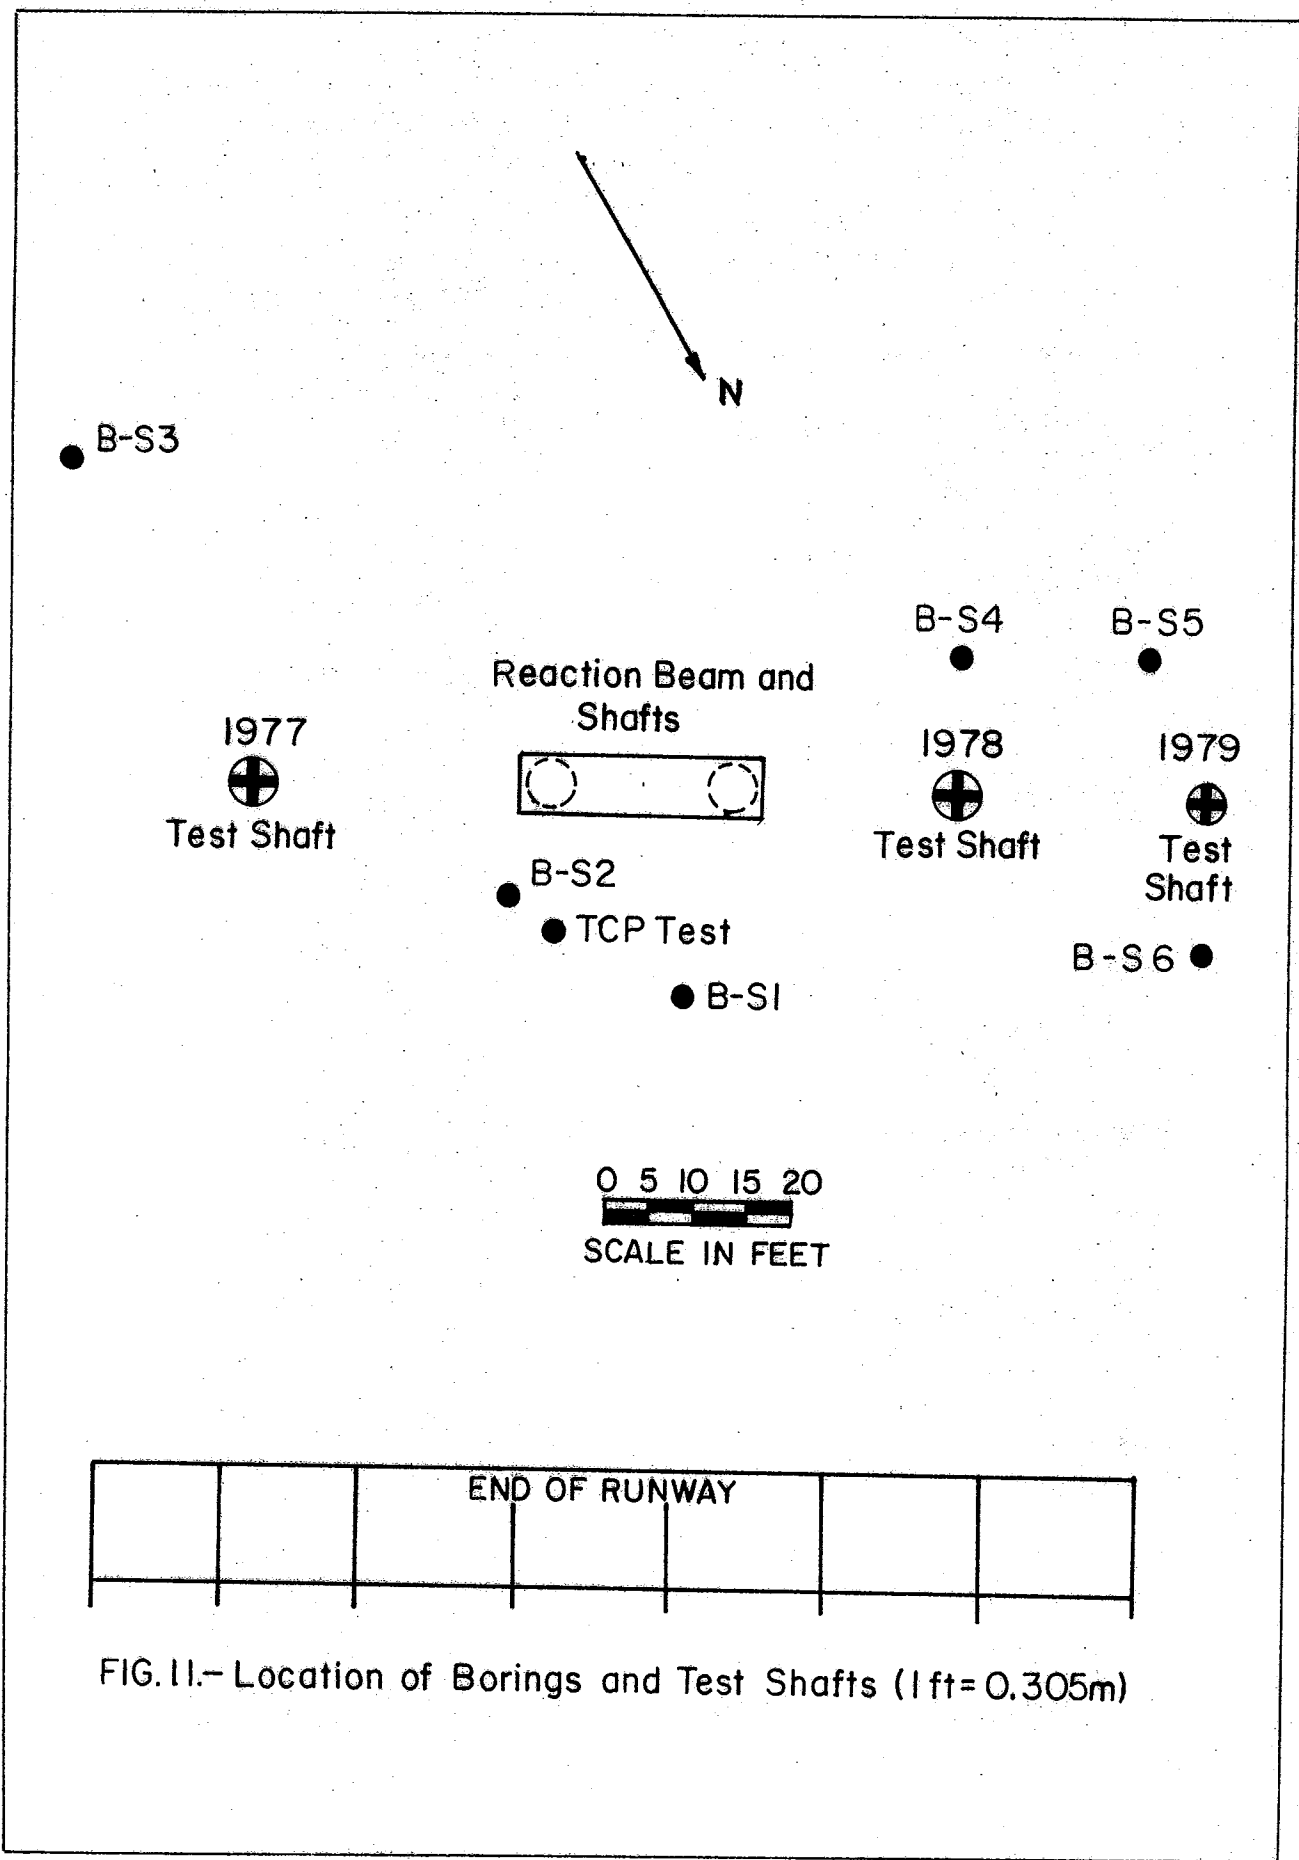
Location of Borings and Test Shafts (1 ft= 0.305m)
